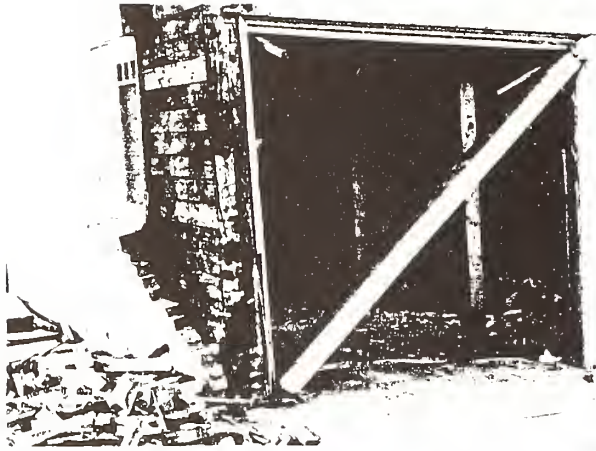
Corner apartment building in the Marina district. The masonry veneer was anchored to the sheathing by nails embedded in the mortar.
